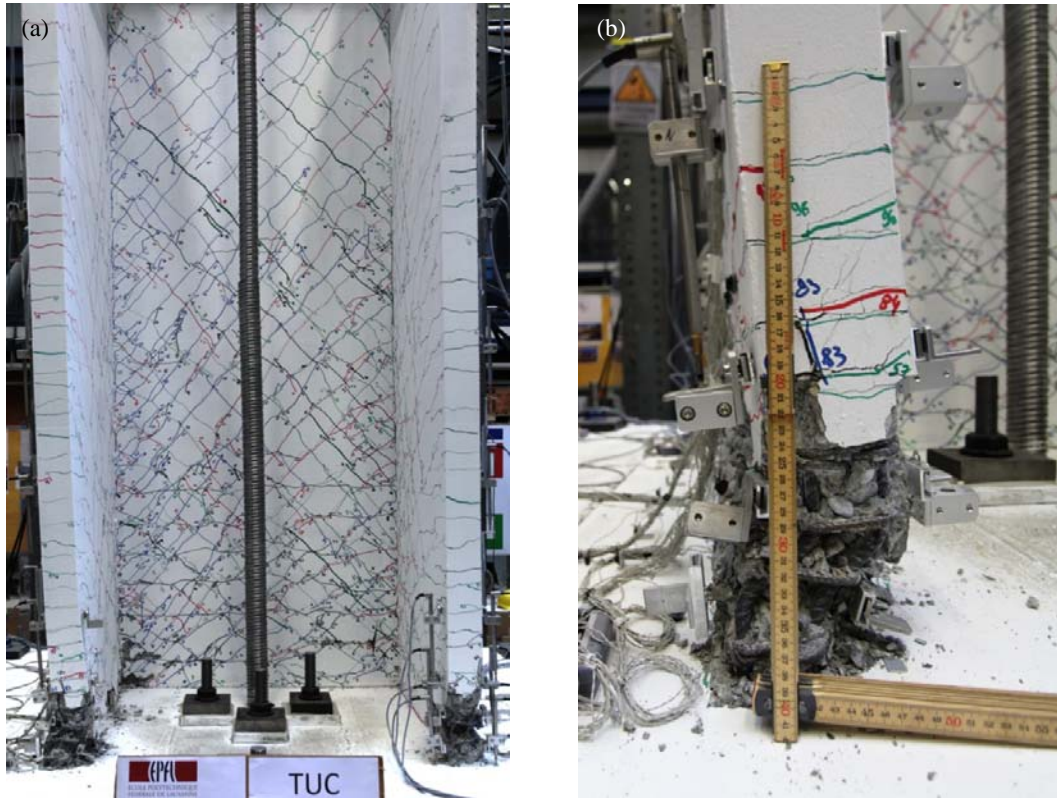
TUC failure at 1.5% drift during loading to position E: out-of-plane buckling and compression failure of the concentrated reinforcement flange. Front view (a) and detailed view of the damaged flange toe (b)
